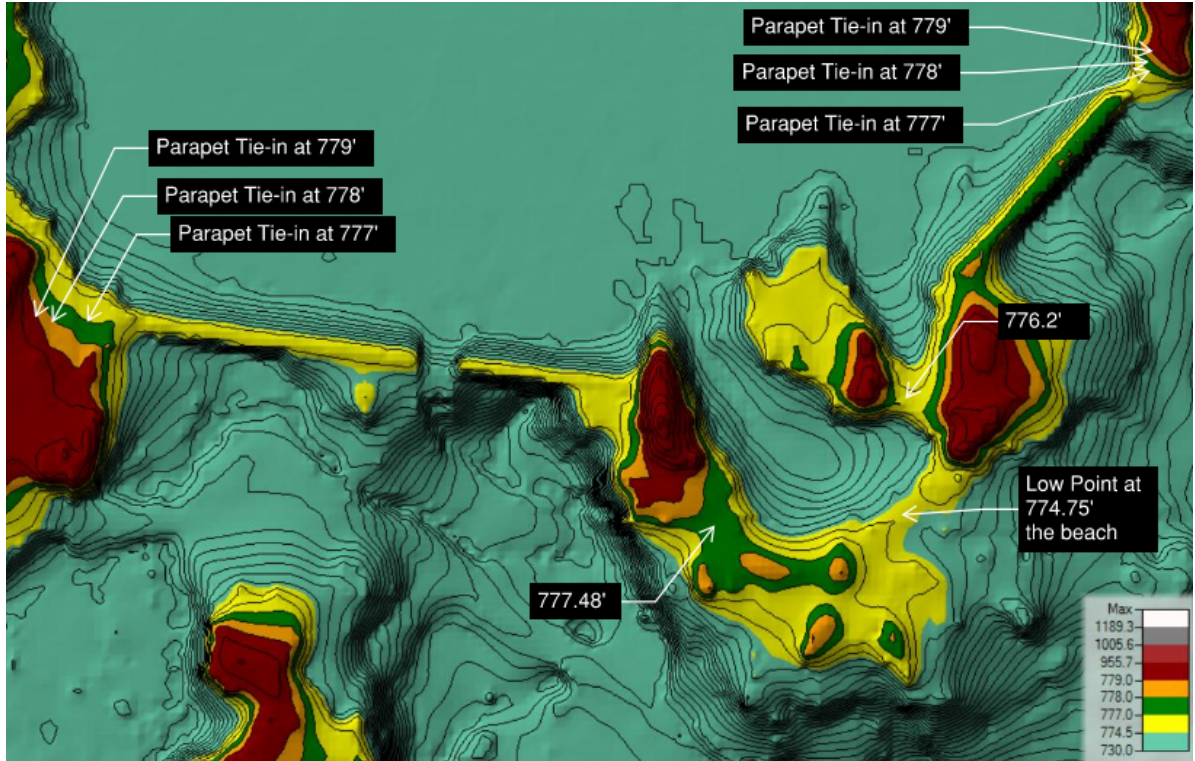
Model schematic of anticipated possible tie-in locations for parapet walls
